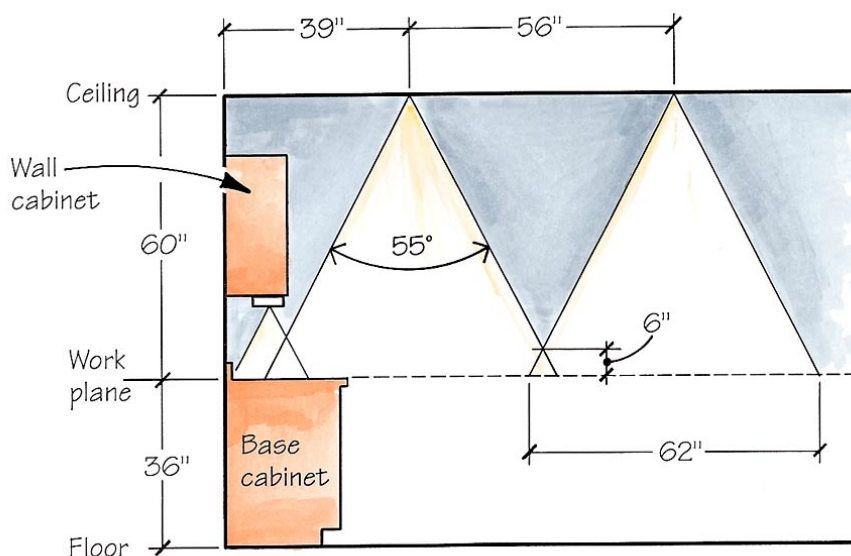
In this kitchen scenario, the lamps have a beam spread of 55 degrees, which provides 62 inches of coverage at countertop height. The fixtures are installed 56 inches apart, producing a 6-inch overlap on the countertop. The first fixture has been shifted to the right to eliminate "scallop" on the wall cabinets, placing it 39 inches from the wall. Undercabinet lighting has been installed for task lighting.
